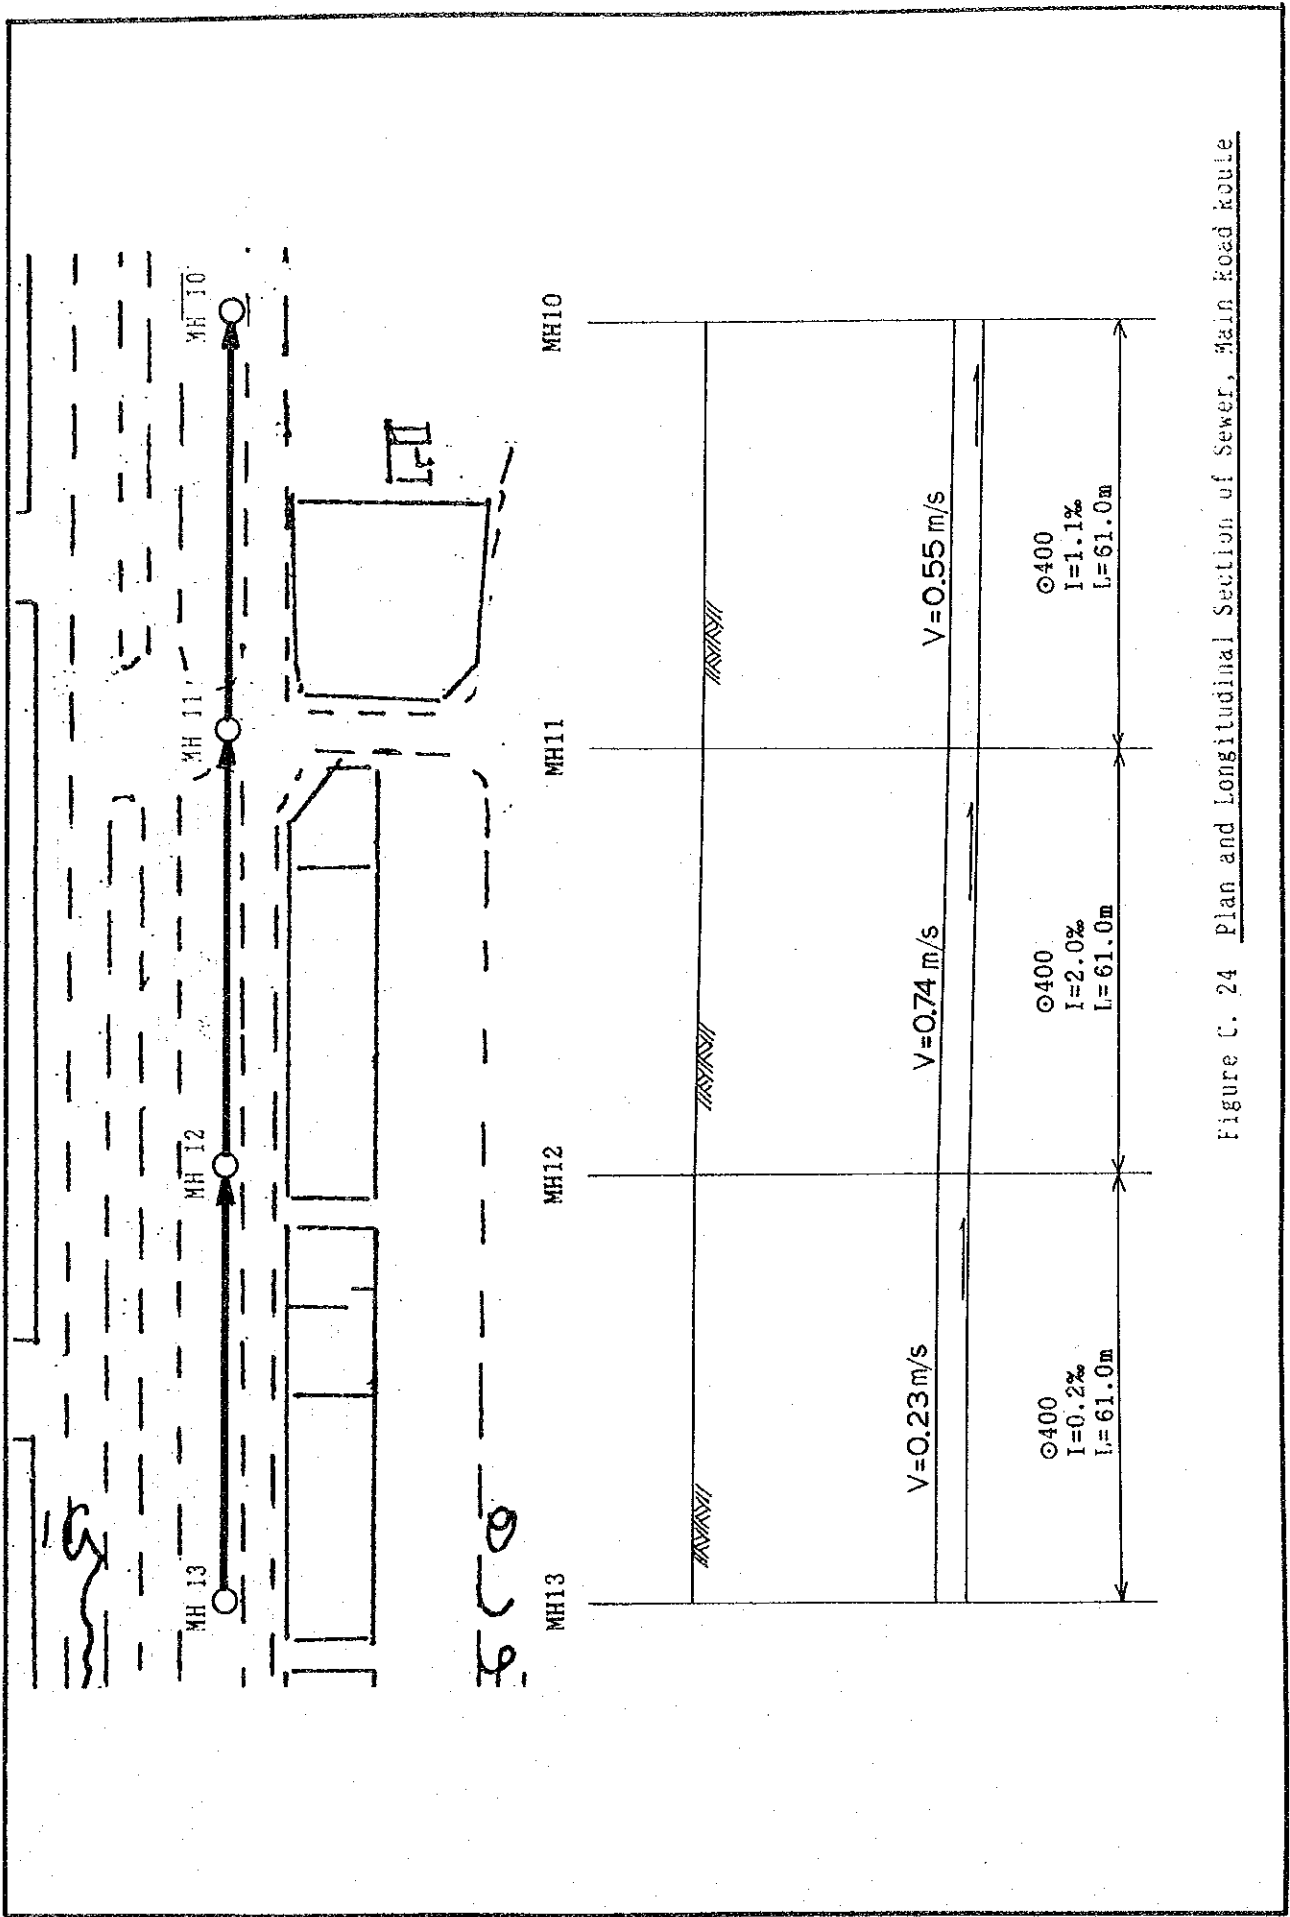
Plan and Longitudinal Section of Sewer, Main road koule
